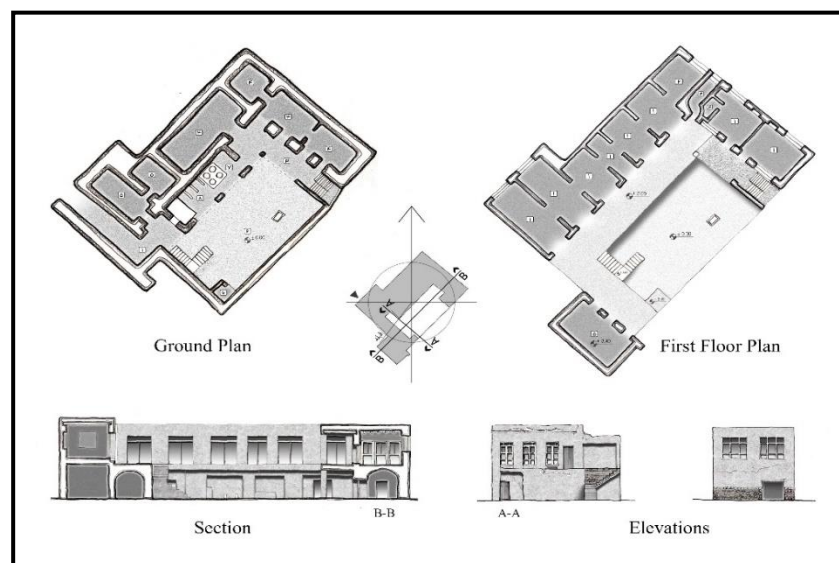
Ground & 1st Floor Plans besides Elevations & Section of 1st Case
